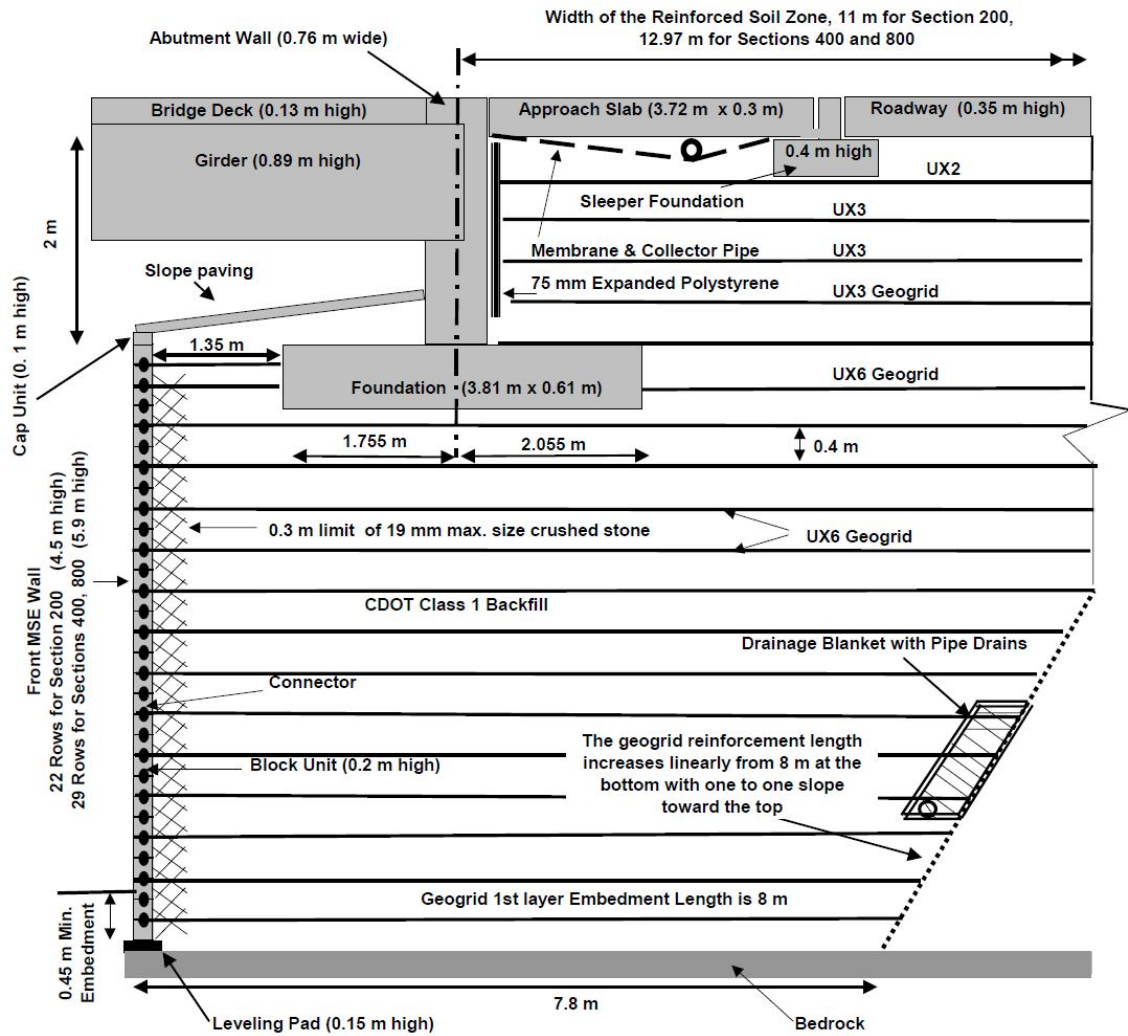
Cross-sectional view of the east GRS bridge abutment for the Founders/Meadows Parkway Bridge (from Abu-Hejleh et al. 2000).
